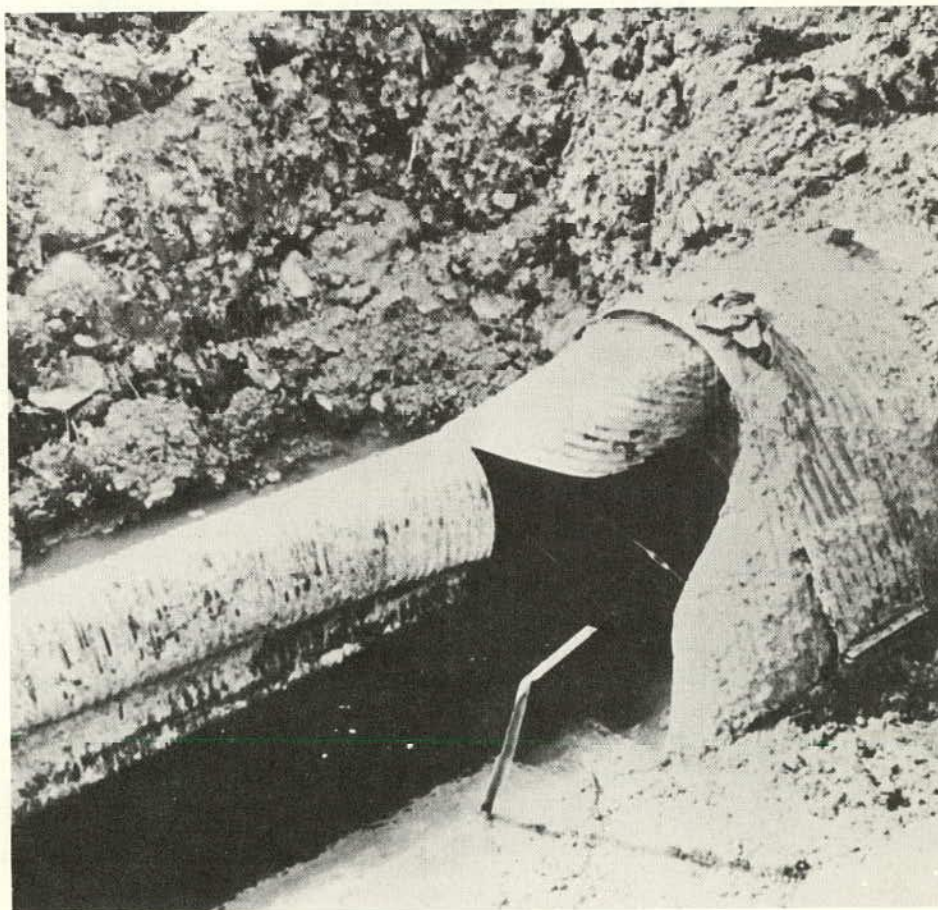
Deflection failure of 96-in.-diameter corrugated steel culvert (Case 5).
